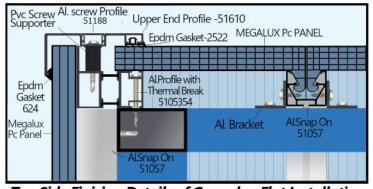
DETAIL OPTIONS for INSTALLATION of MEGALUX Pc PANEL & AL. SNAP ON- 51057
